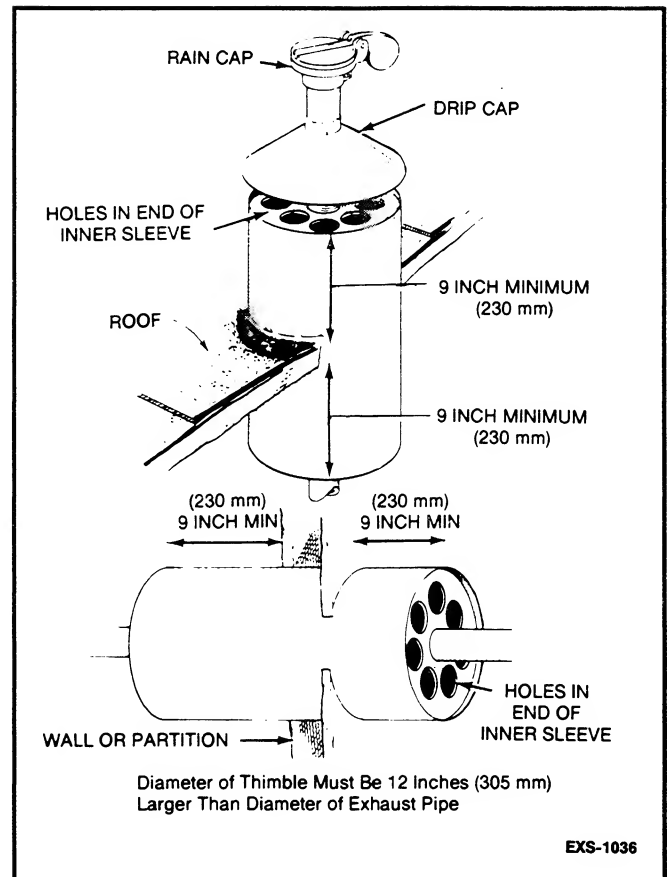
MOUNTING EXHAUST THIMBLE THROUGH ROOF OR WALL
